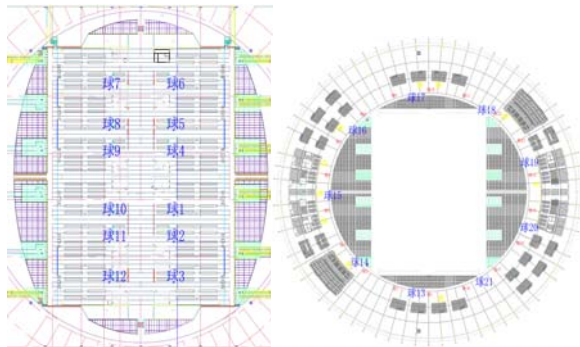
Measuring points of balloons in 7.5m elevation internal hall and 9.9m elevation perimeter hall
